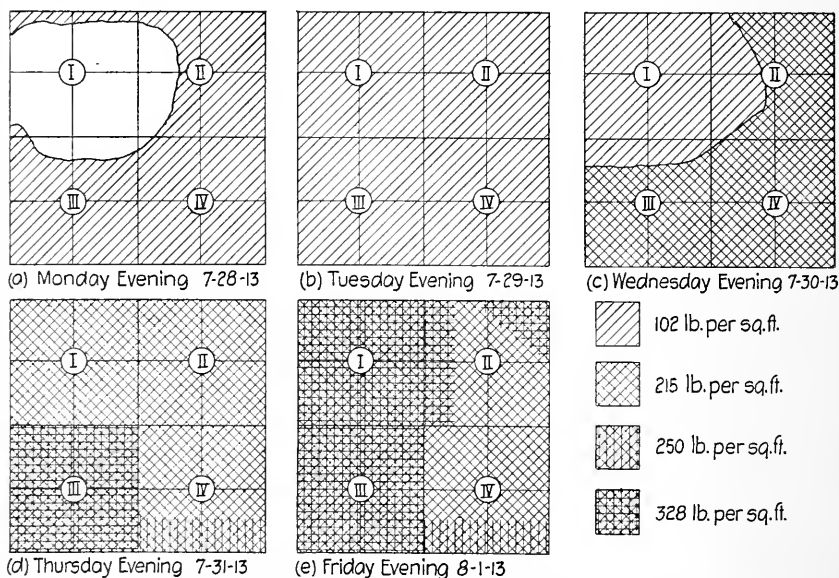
PLAN SHOWING DISTRIBUTION OF LOAD OVER WORCESTER TEST FLOOR AT SUCCESSIVE STAGES OF THE TEST.
